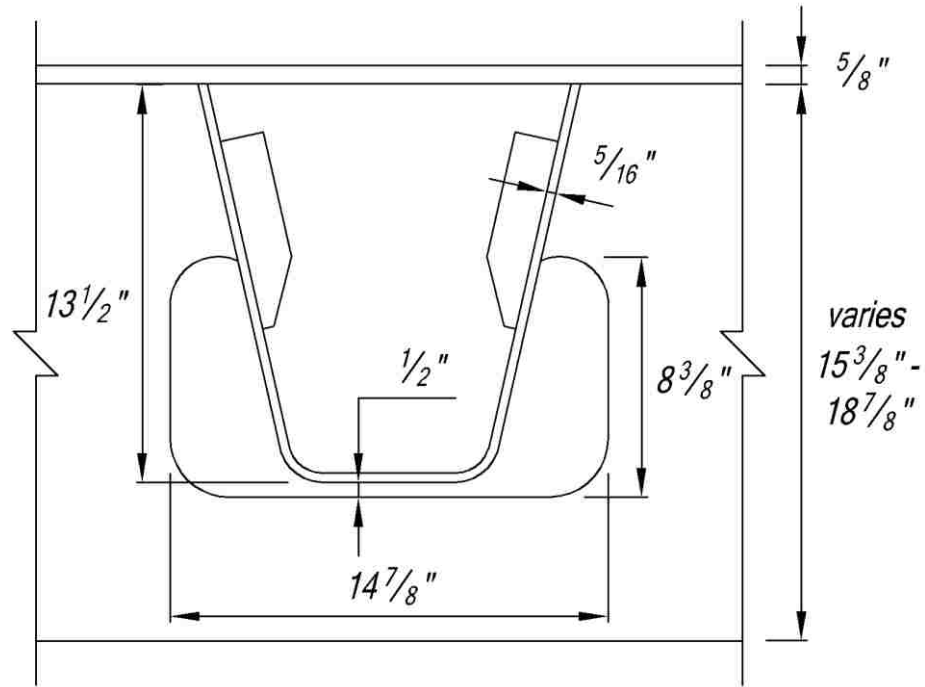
Dimensions of the Bronx Whitestone Bridge rib-to-floor beam connection
